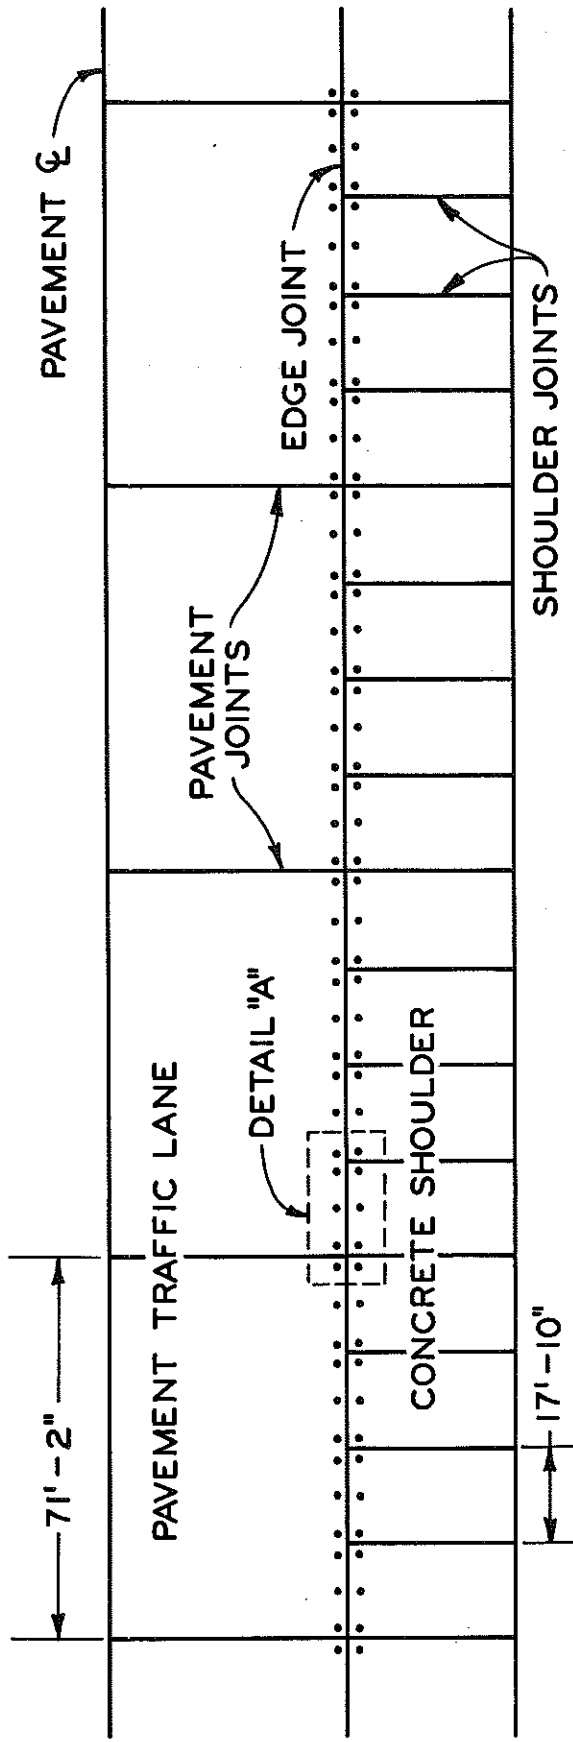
Rivet locations for instrumented sections of concrete shoulder project. One section of 16 shoulder slabs was instrumented as shown in each of 3 half mile test sections. One contains an expansion joint at center of instrumented section, and the other two have an expansion joint at one end.
